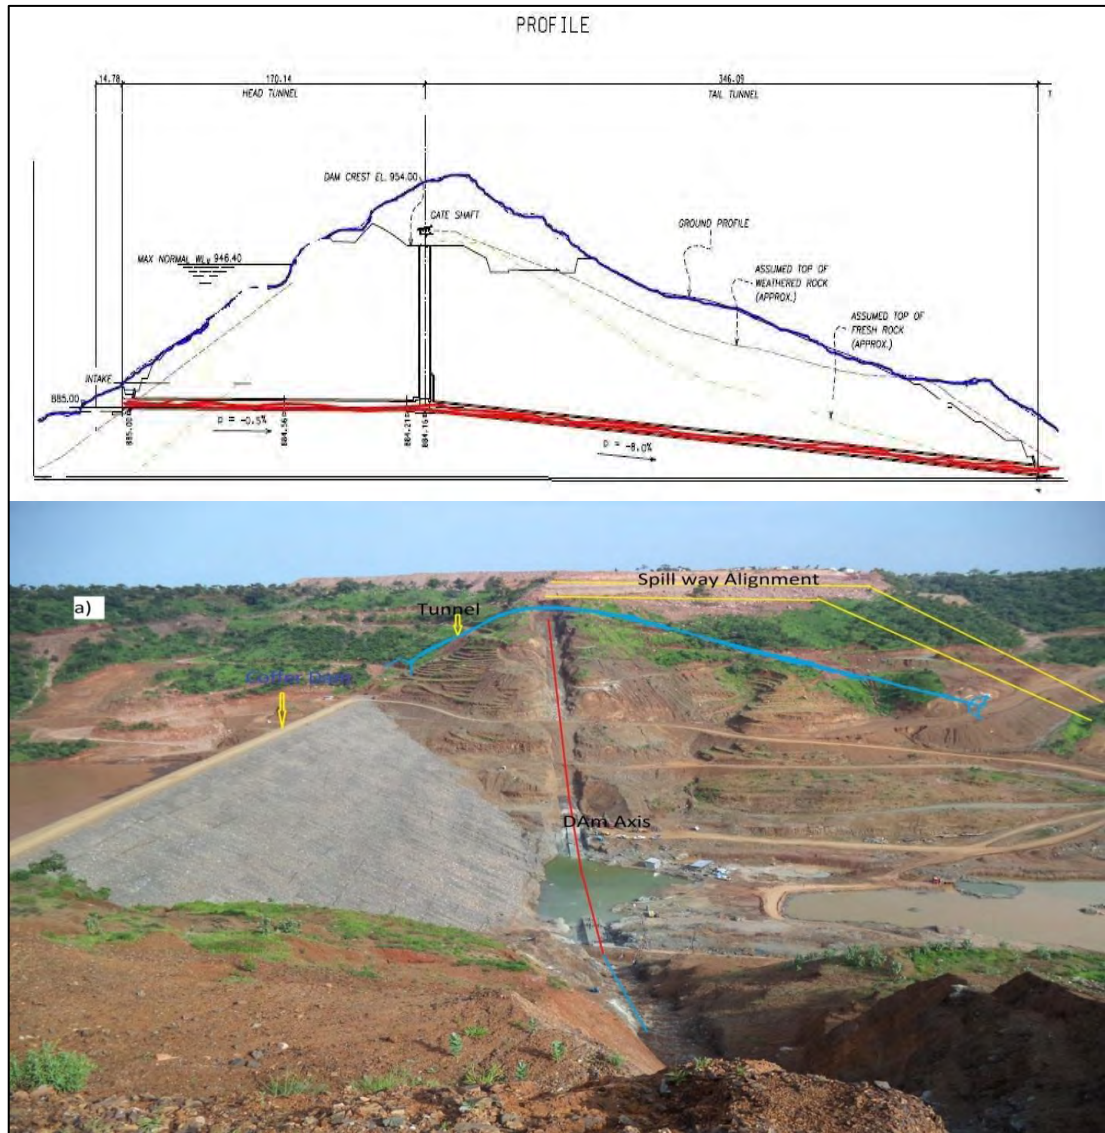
5: The tunnel alignment veiwing from rigth bank to left dam abutment
